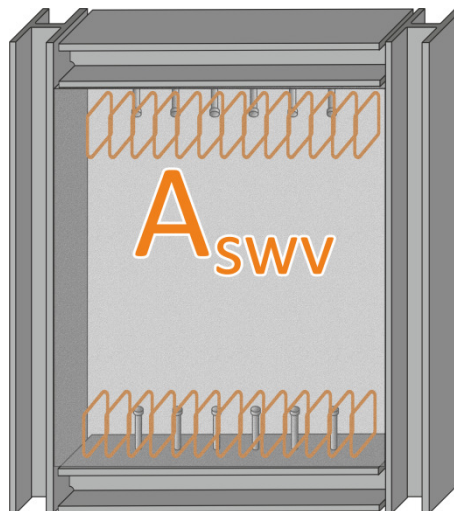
REINFORCEMENT NEEDED BY THE STUD CONNECTORS RESISTING HORIZONTAL SHEAR
